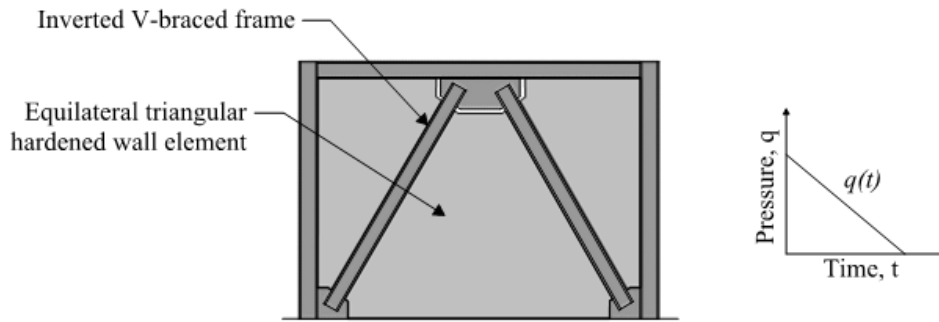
Equilateral triangular hardened wall element simply-supported in-plane of inverted V-braced frame and uniformly loaded by blast infill pressure.
